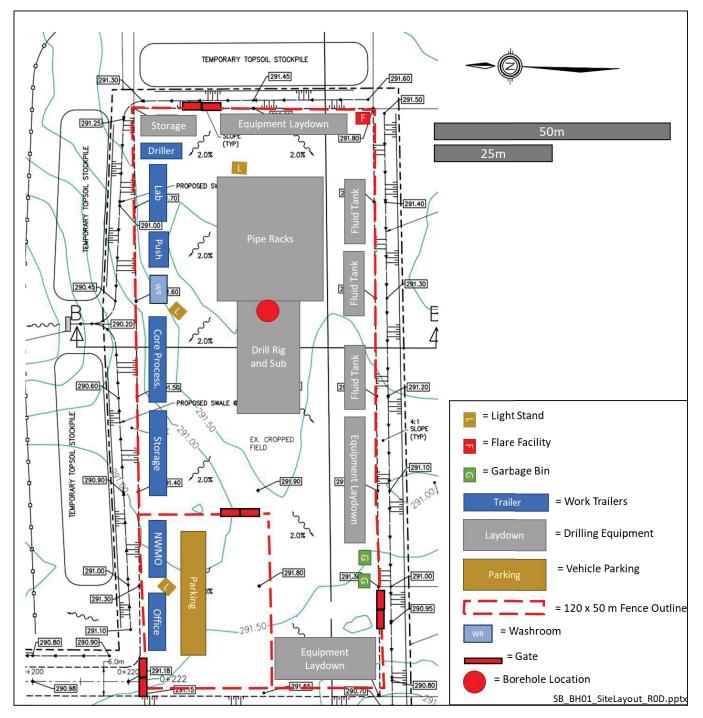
SB\_BH01 Drill Site Layout – Final Layout after Site Commissioning
